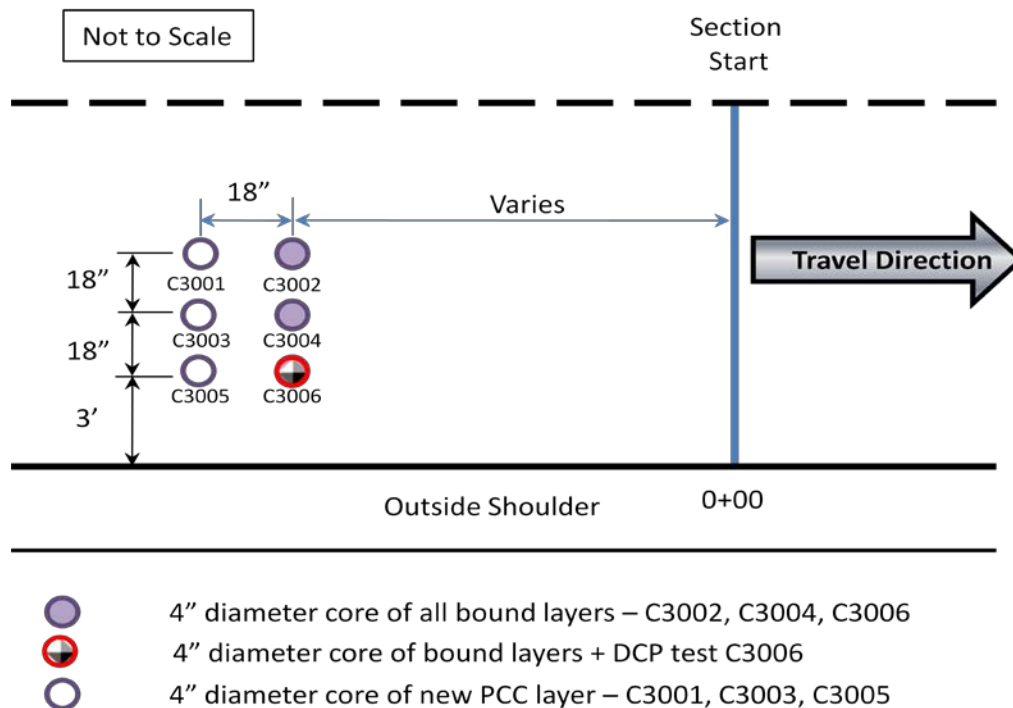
Standard sampling plan locations at approach end LTPP tests sections with new PCC layers.
